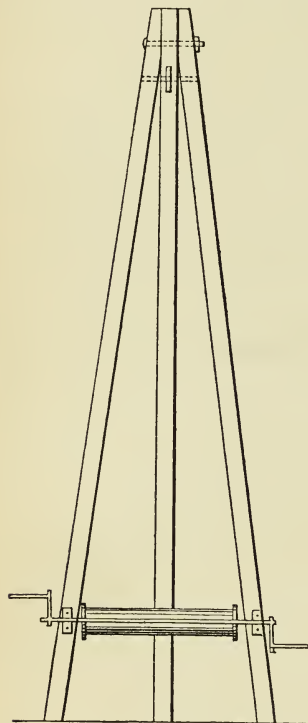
HEAD GEAR AND WINDLASS FOR BORING.
